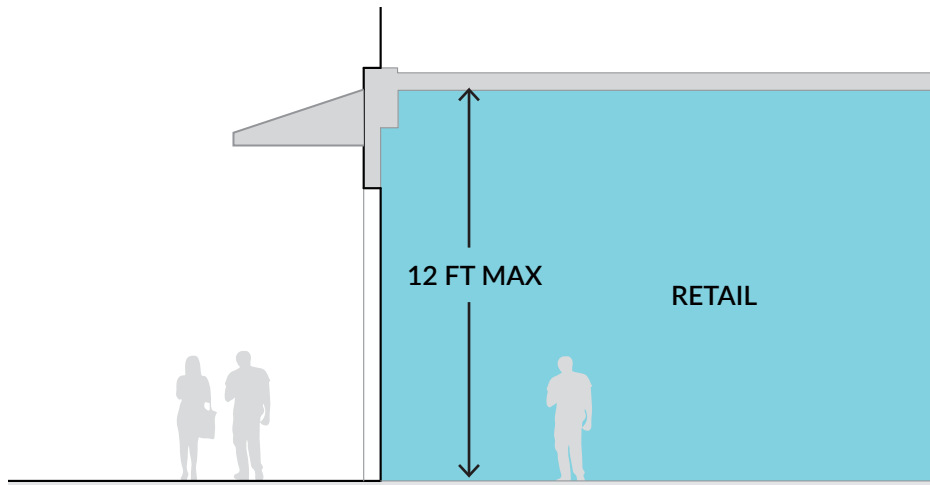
Clear ceiling height in ground-floor commercial spaces.
